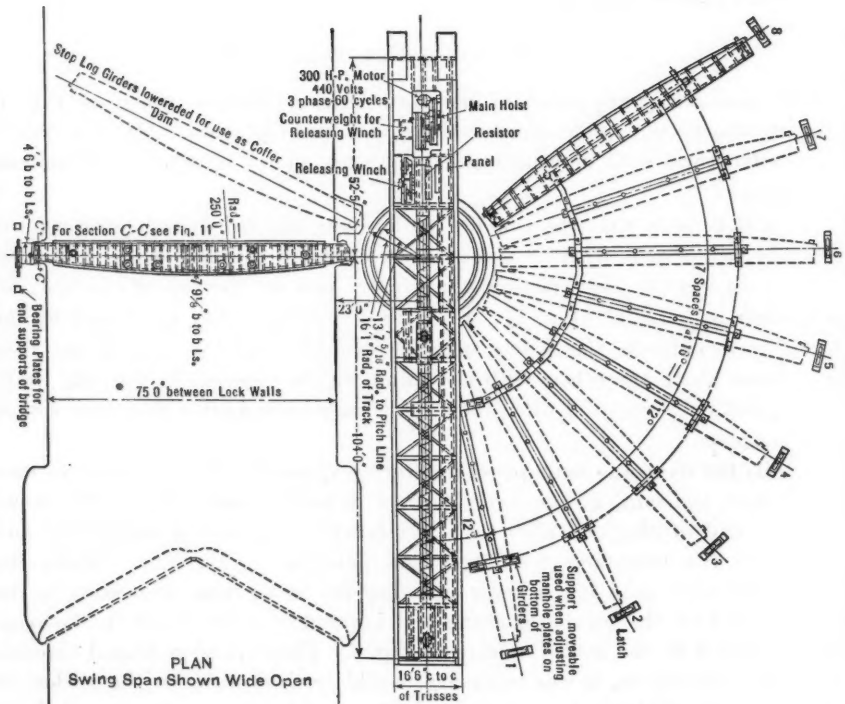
GENERAL PLAN, NEW ORLEANS EMERGENCY DAM.
